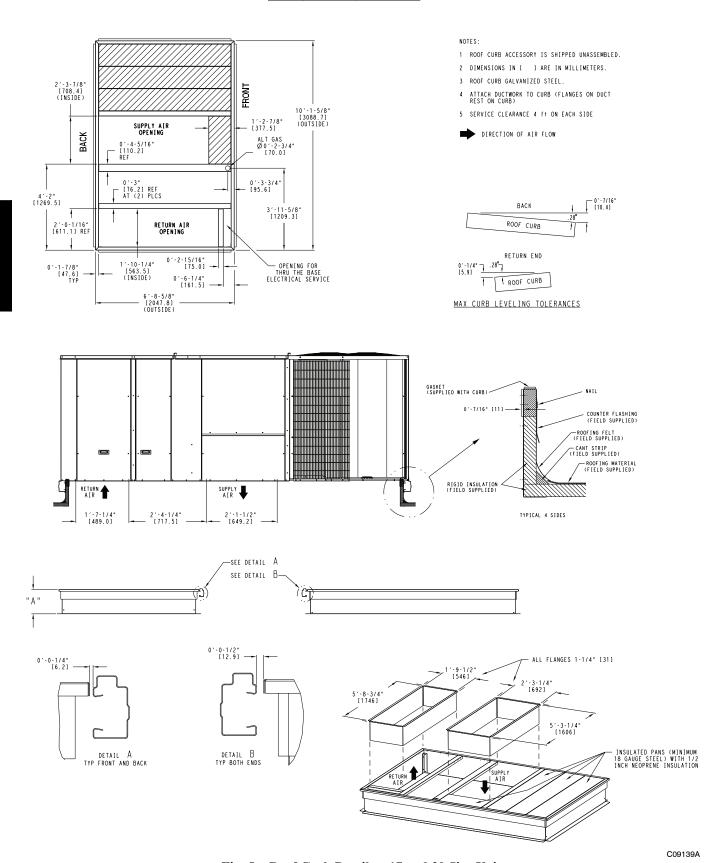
Roof Curb Details - 17 and 20 Size Units
